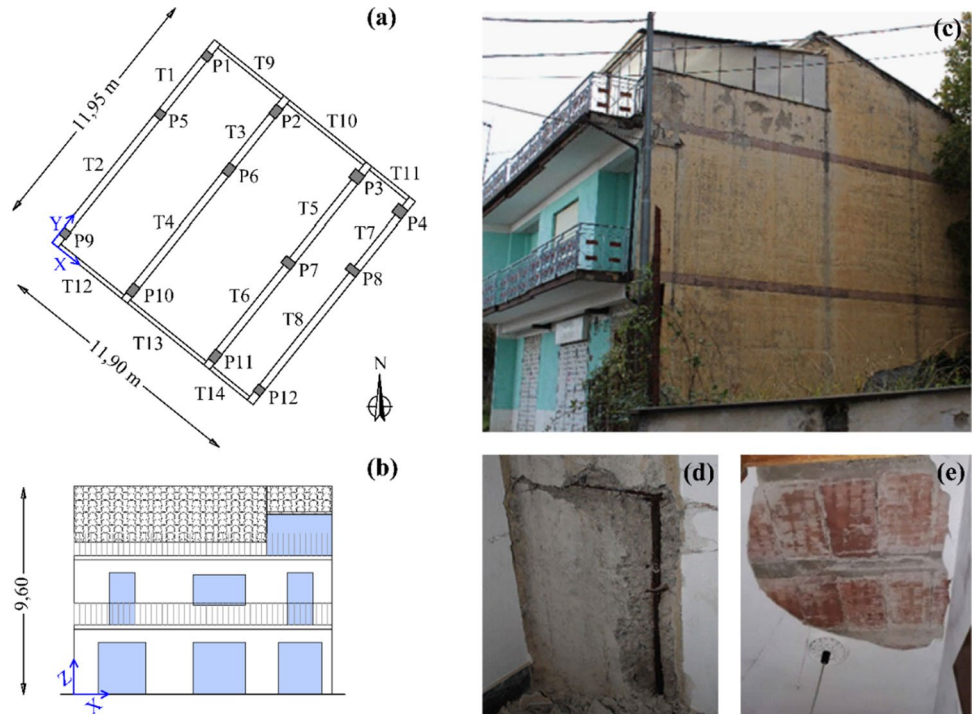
Geometrical plan (a) and front view of the S–W facade (b); external picture (c); smooth bars at the base of the column (d); R.C. with hollow tiles mixed floor, with focus on the RC joists and hollow bricks (e) (from in situ survey in December 2020)
